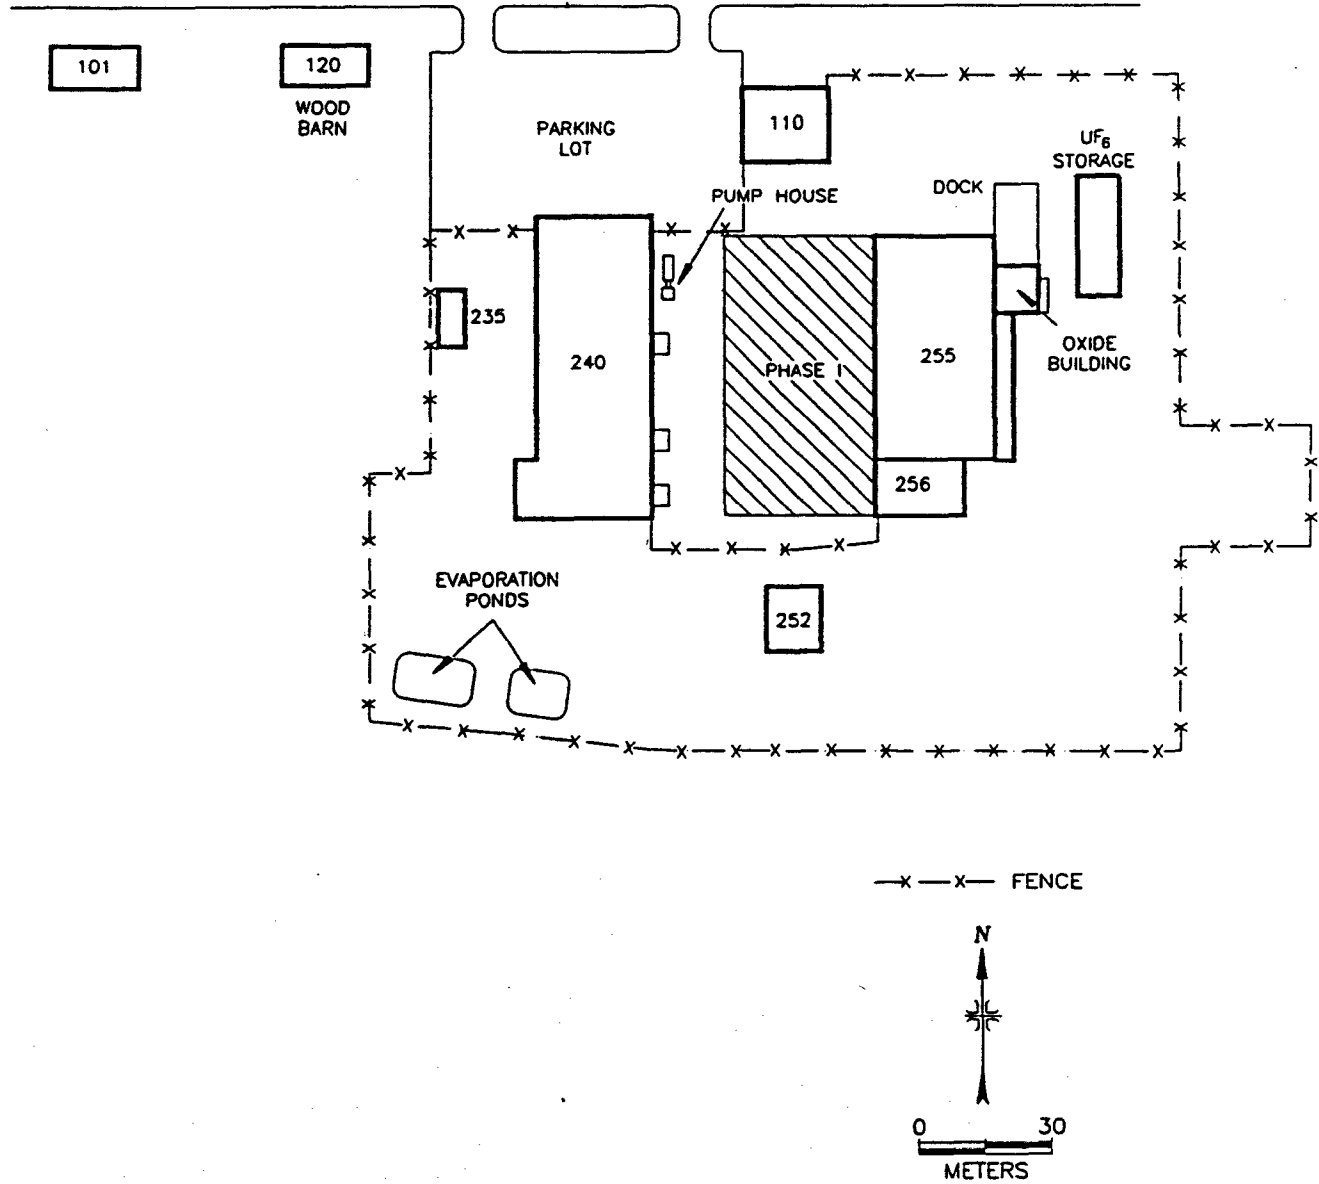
Layout of Plant Facility Indicating Phase I Construction Area
